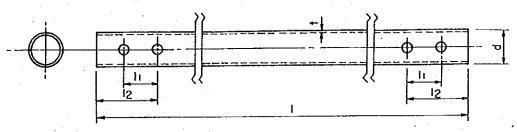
Standard Shape of Pipe for Guard Pipe
